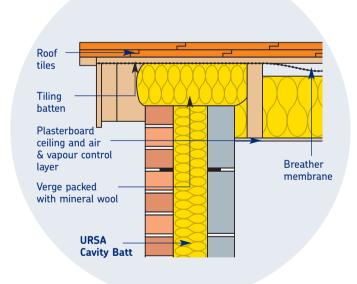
Warm Pitched Roof - Gable/Verge Detail
